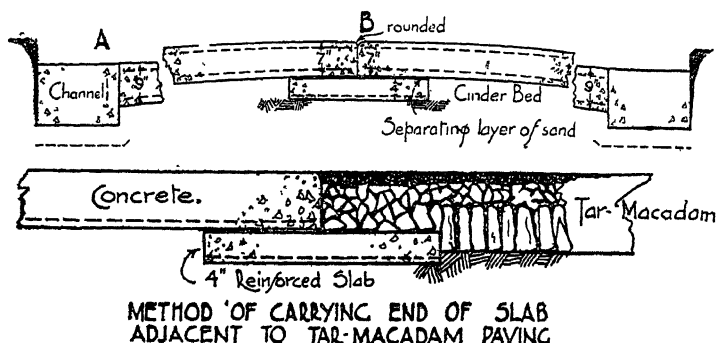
BASE SLAB CONSTRUCTION. JUNCTION OF CONCRETE AND BITUMINOUS MACADAM.
